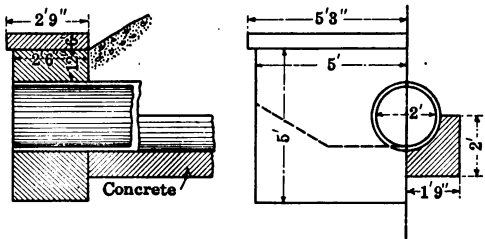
Kansas City and Omaha Railroad Standard Tile Culvert.
